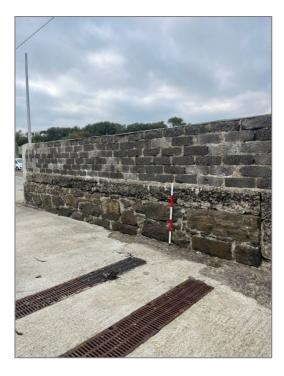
Possible original courses of pier wall beneath modern expansion. From the southeast.
